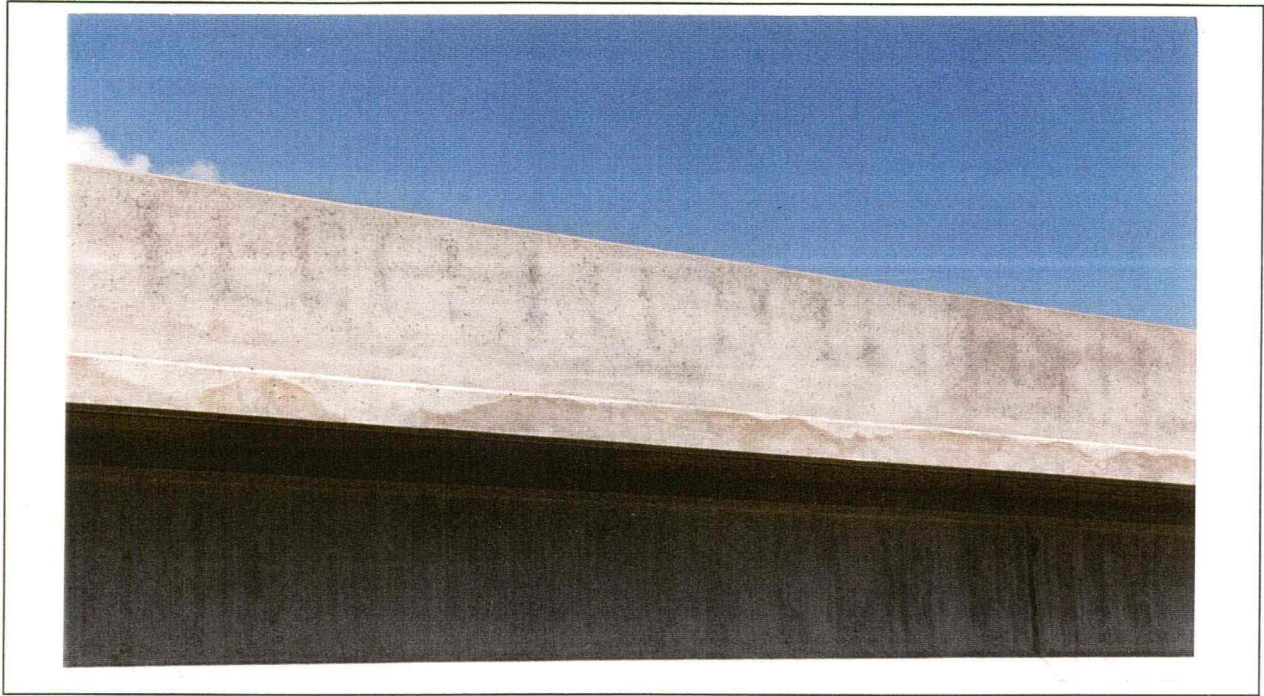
View of barrier rail showing “legibility” of reinforcing through rail concrete surface and slurry staining on slab edge from rail forming operation.
